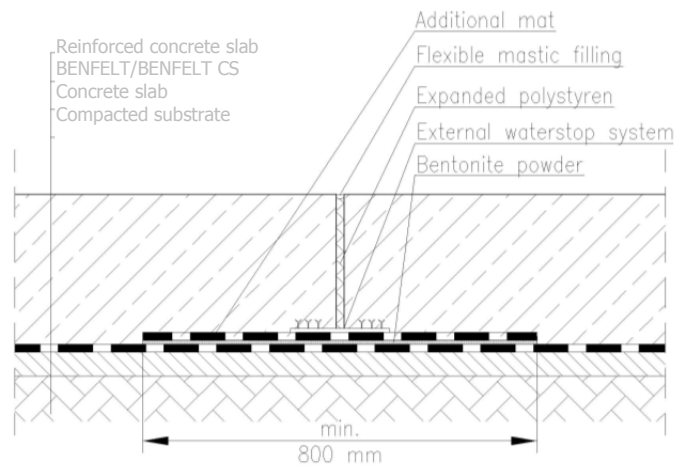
Installation of the mat under the expansion joint of the foundation board - sealed with the external expansion joint tape.
